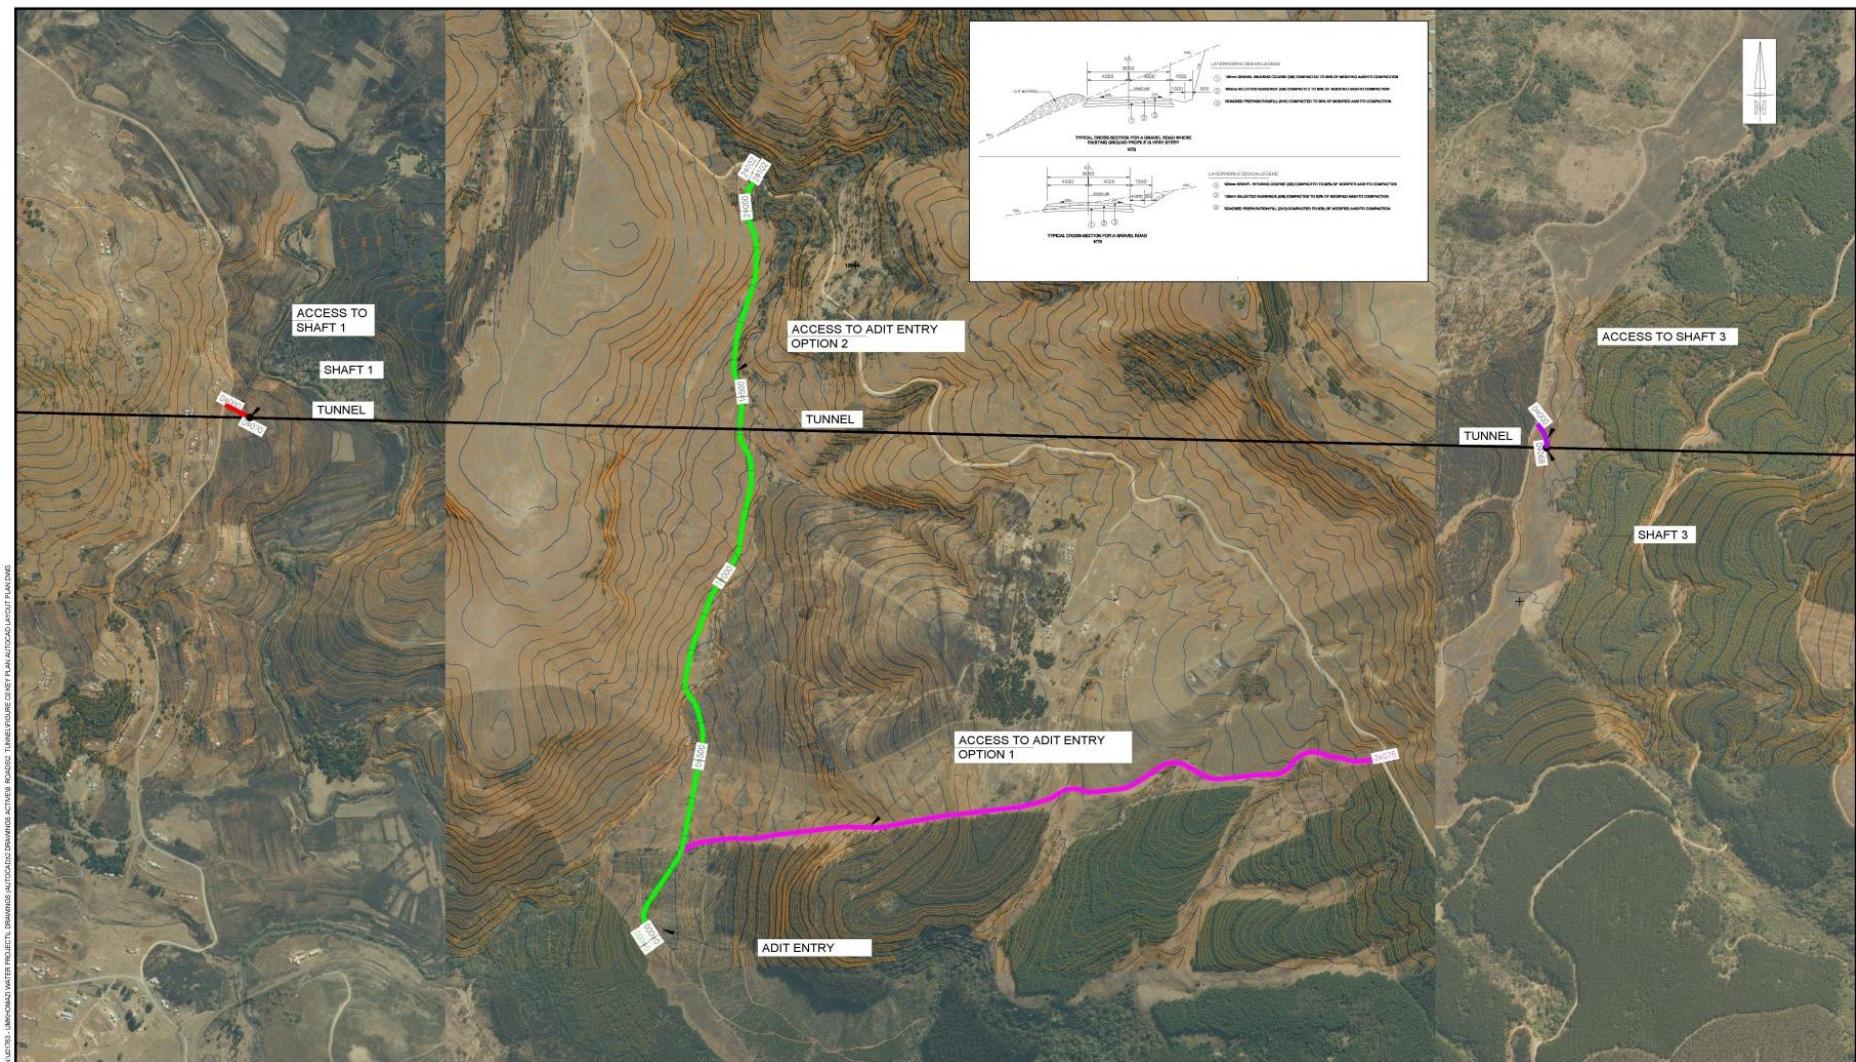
A.3: Transfer tunnel – Layout of access roads to shaft 1, adit entry and shaft 3
